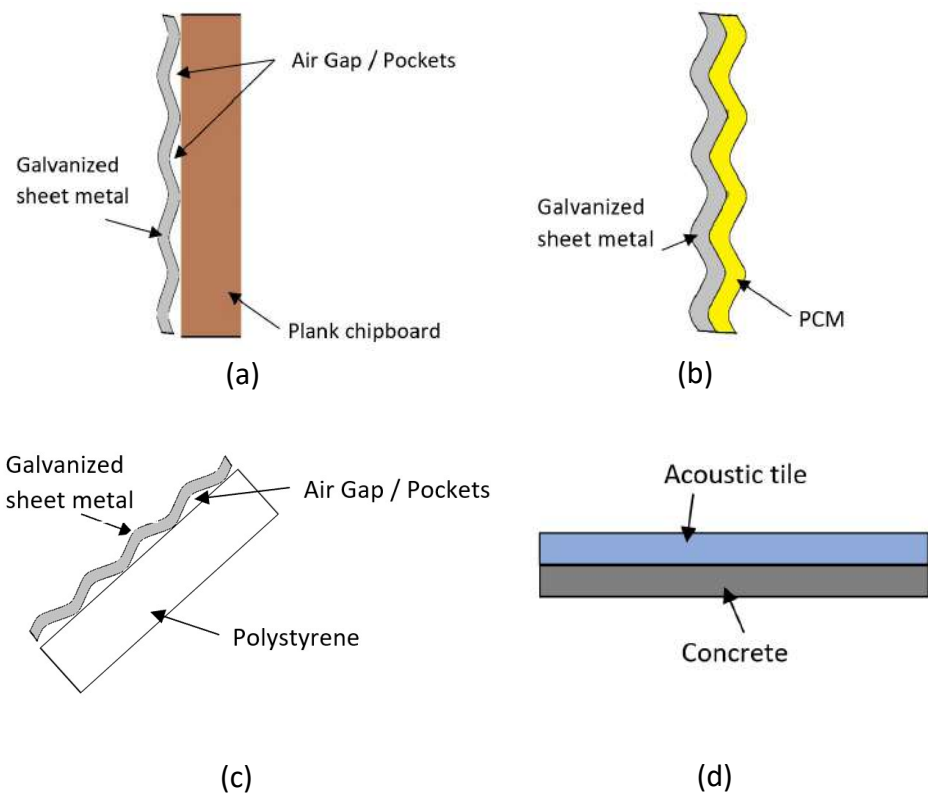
Construction Material Layers: (a) shack wall layer without PCM, (b) PCM incorporation into the shack wall layer, (c) roof layer and (d) inside floor.
